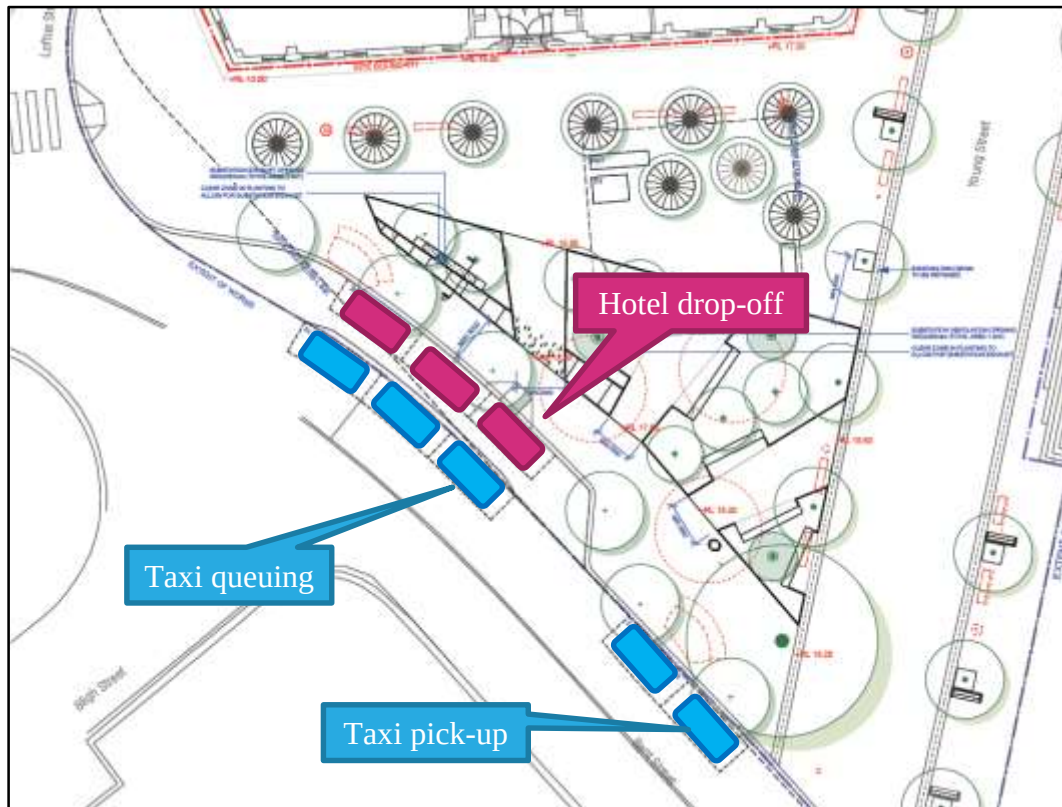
Proposed hotel drop-off and taxi arrangements in Bent Street
